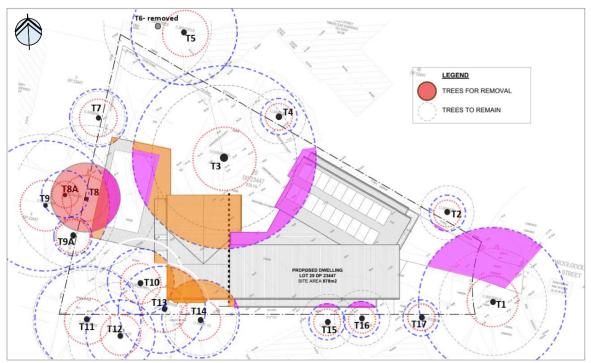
Extract from Arboricultural Impact Assessment report showing tree encroachments (pink shading denotes encroachment at ground level, orange denotes encroachment above grade)
